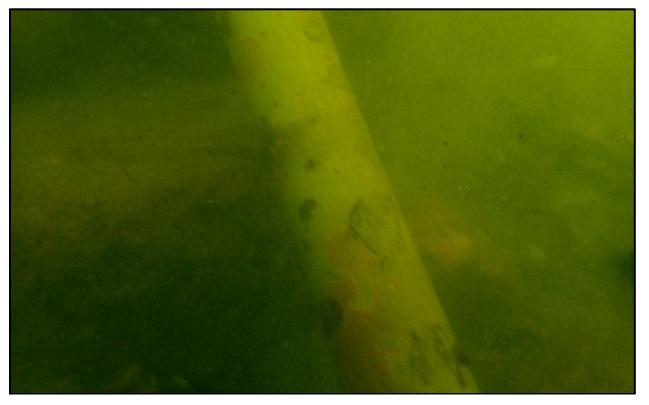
Accessory structure running underneath/diagonal to southern intake pipeline route; Date: 11/1/2018
